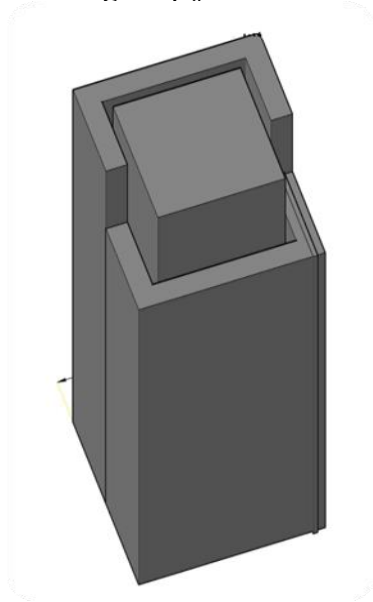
Column confined with "C" shaped prefabricated ferrocement jacket.
